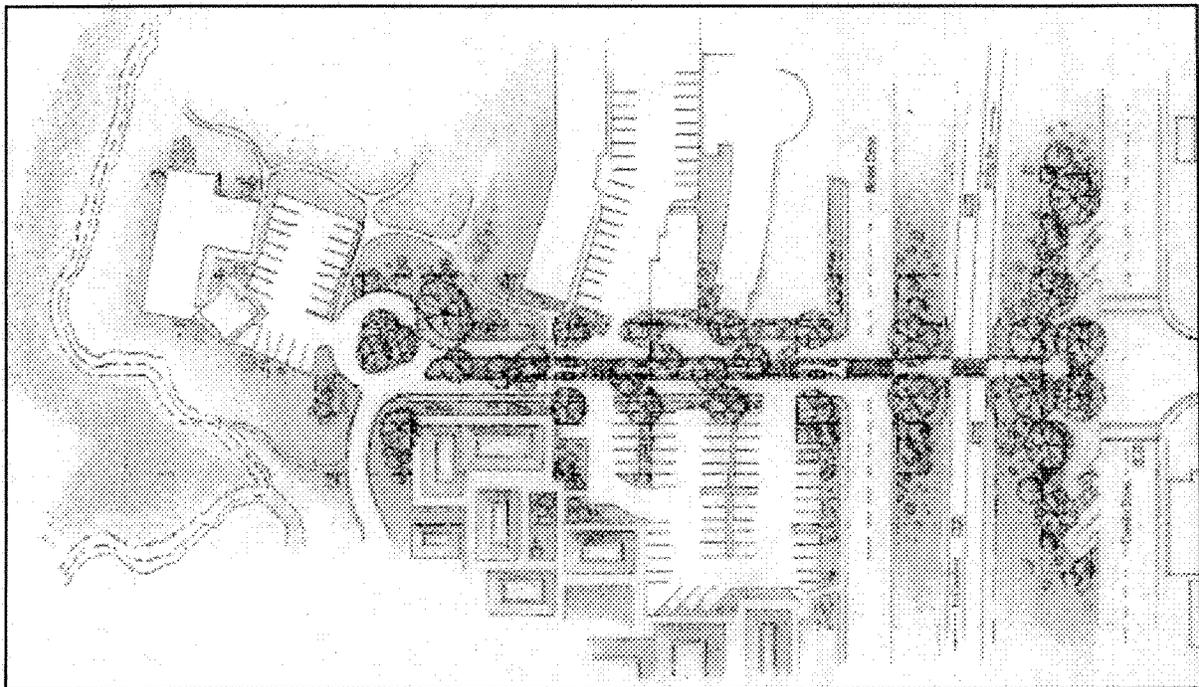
Highway One Crossing Plan, San Simeon Acres
